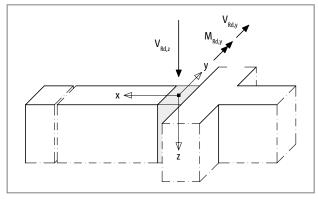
Schöck Isokorb® T type W: Sign rule for the design
